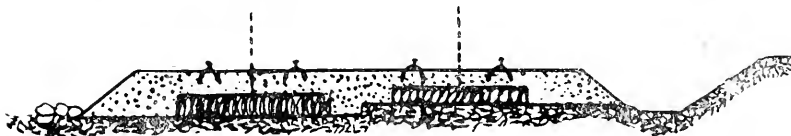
FIG. C—SECTION OF A ROADBED WITH PACKING LAYER CONSTRUCTED THROUGH A CLAY CUT IN 1879.
